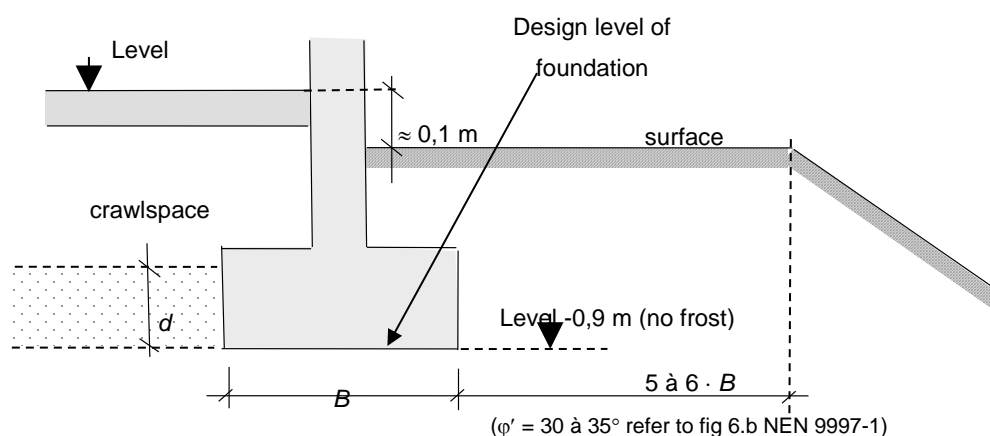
Leading soil coverage  $d$  next to the foundation (strip- or rectangular footing)
